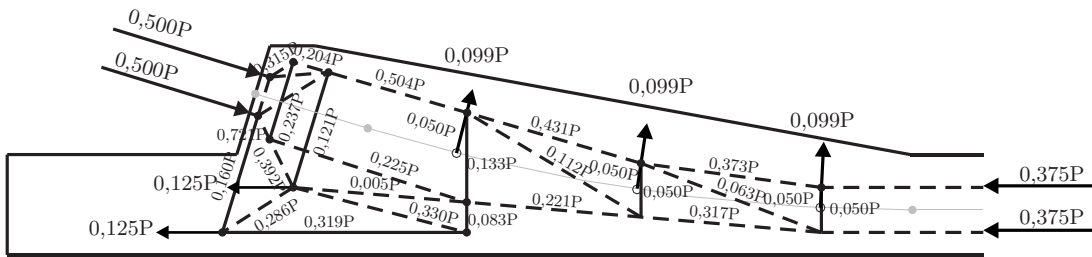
Strut and tie model - Section B-B (detail of the anchorage zone)
